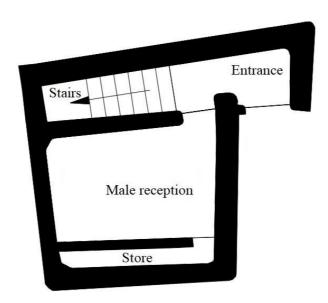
Example 4 showing the layout of floor plans and section (Institute of Ghadames urban development, 2018)
